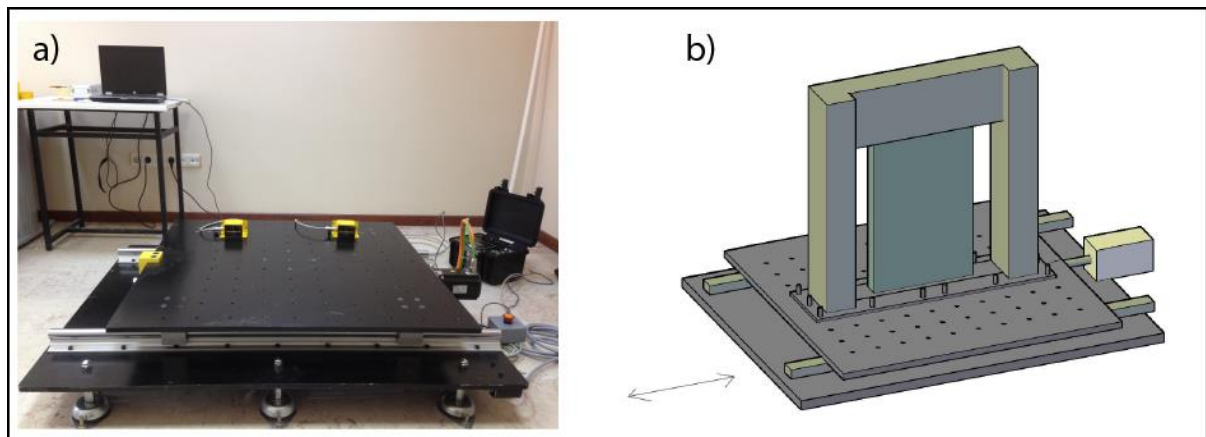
a) Shake table and instrumentation b) general layout of the scaled test-specimen
